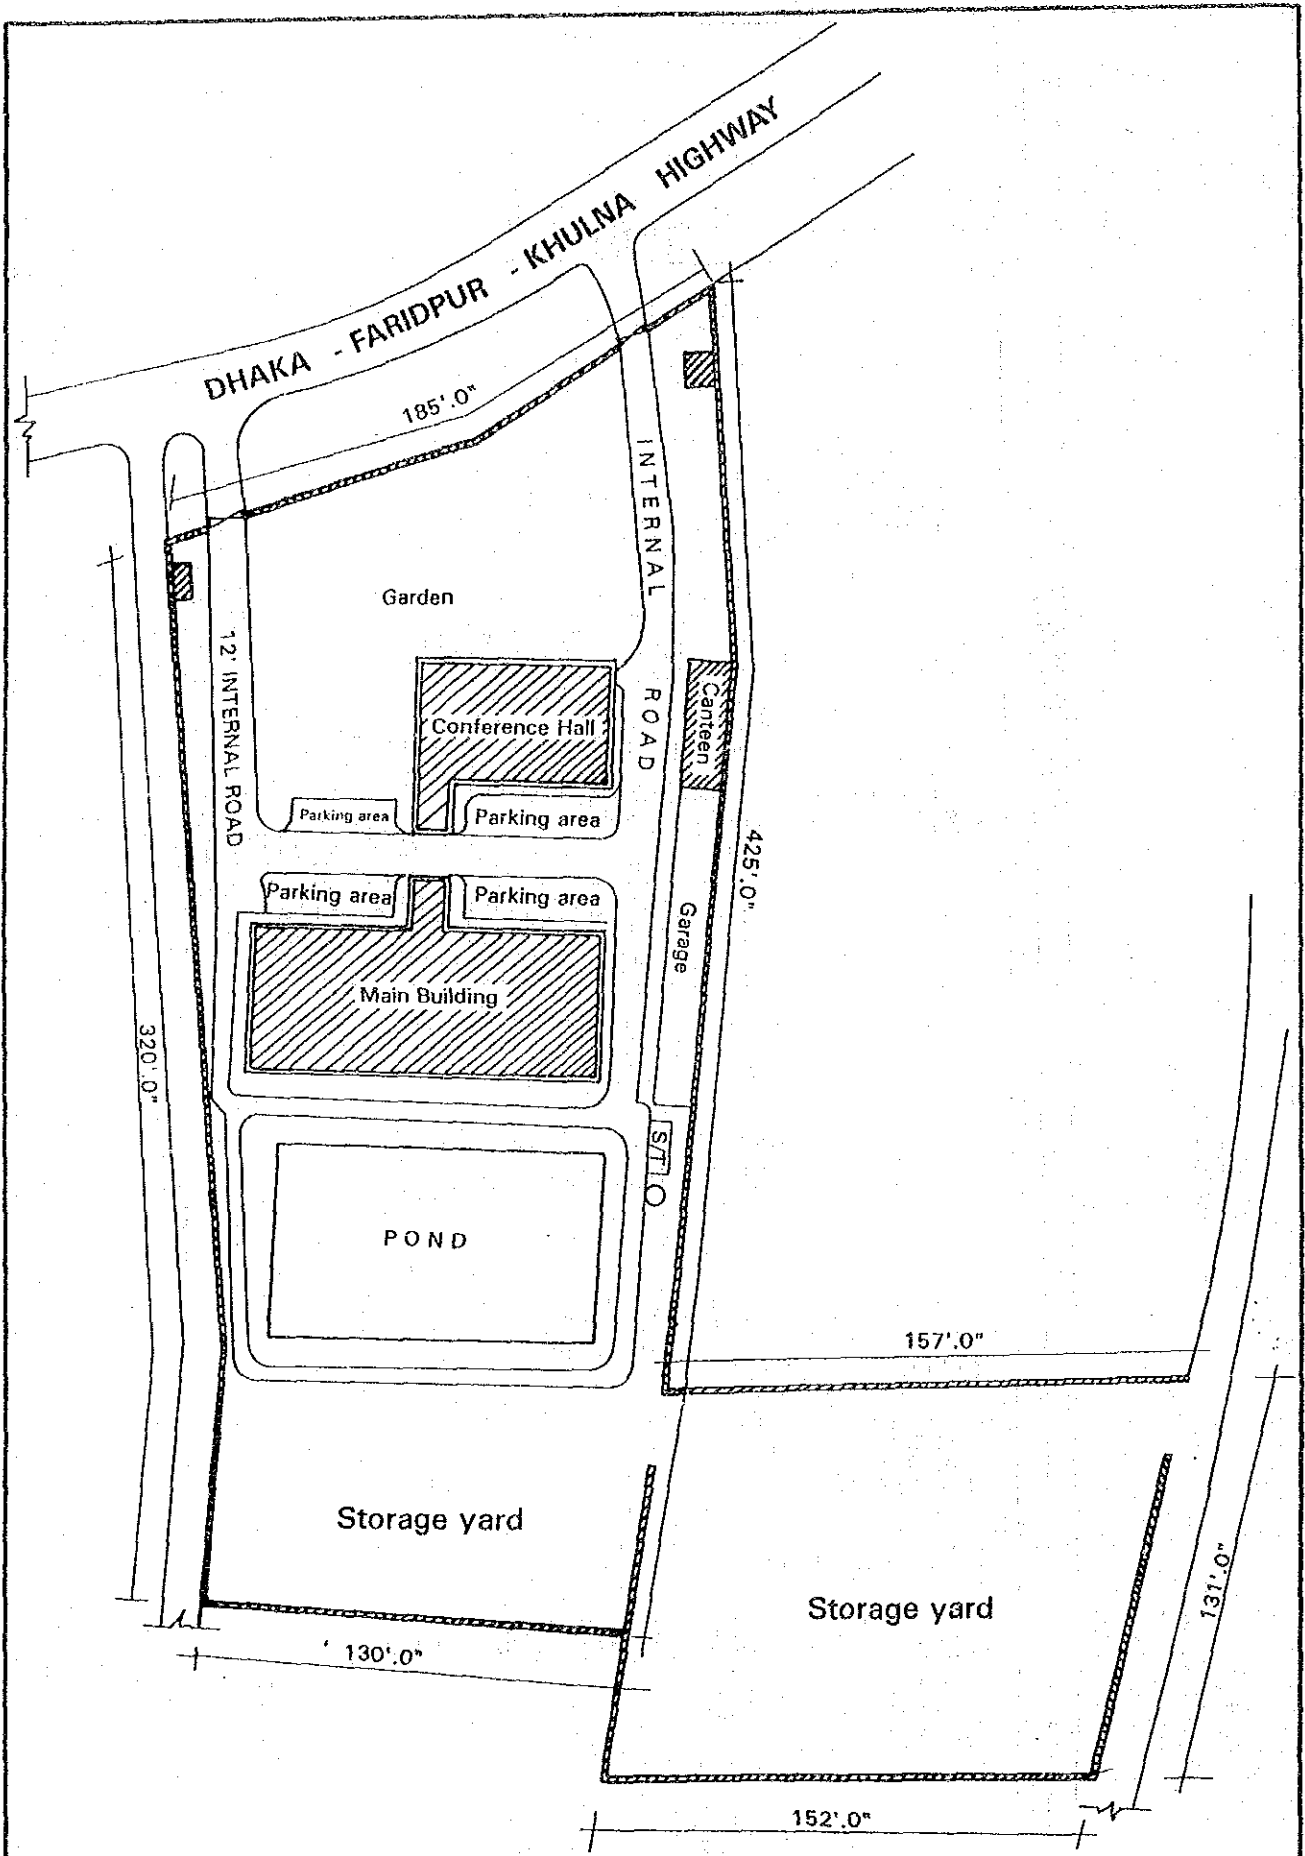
LAYOUT OF LGED FARIDPUR RESP HQ AND STORAGE YARD
